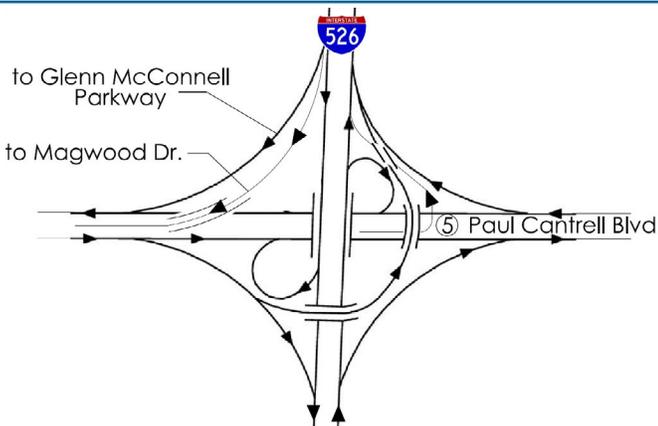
I-526 at Paul Cantrell Boulevard Alternative 5
